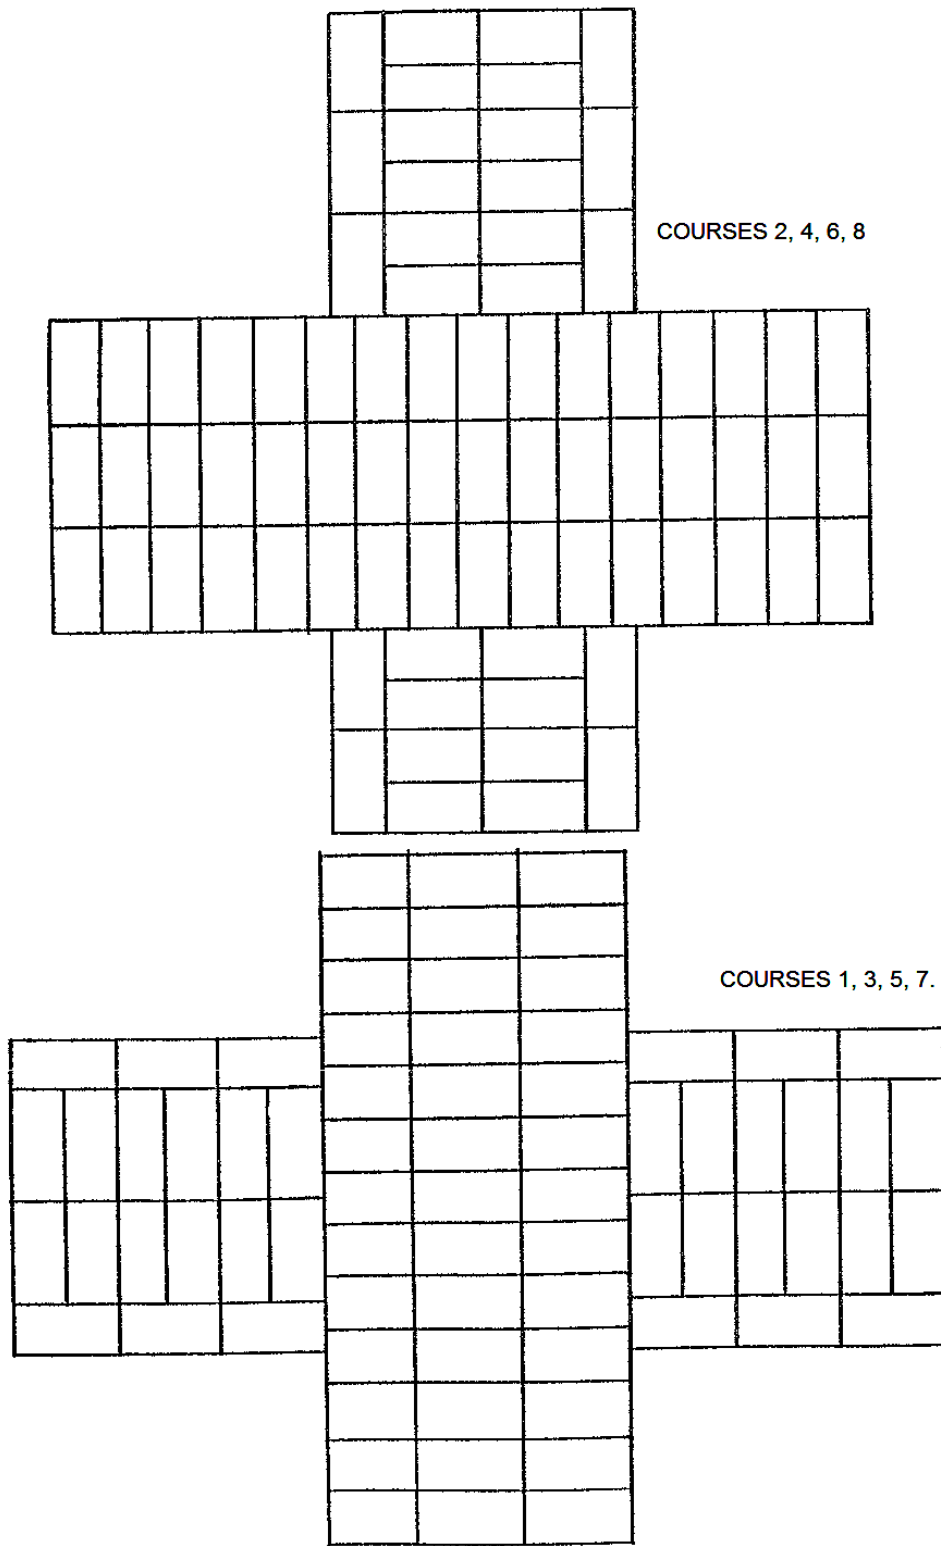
Alternate plan courses of a crossed intersection between two three-brick walls laid in English bond
